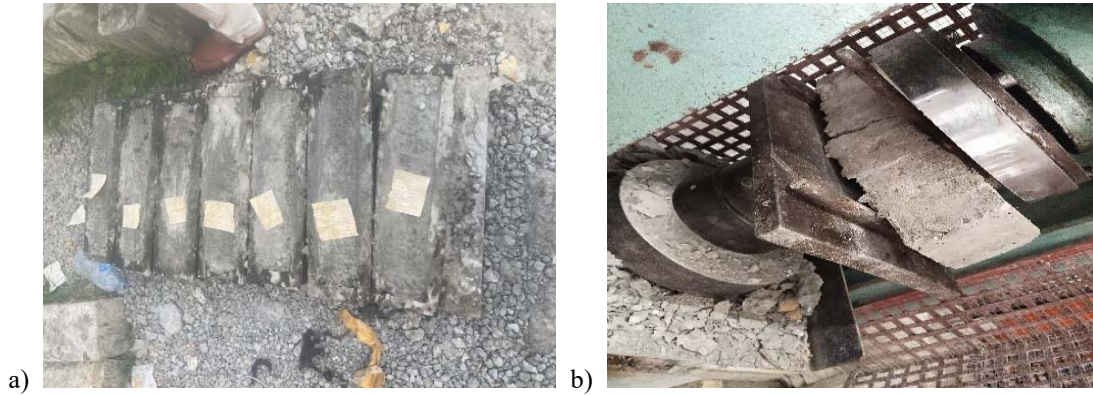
Beam, a. casting of the beam, and b. testing of beam
